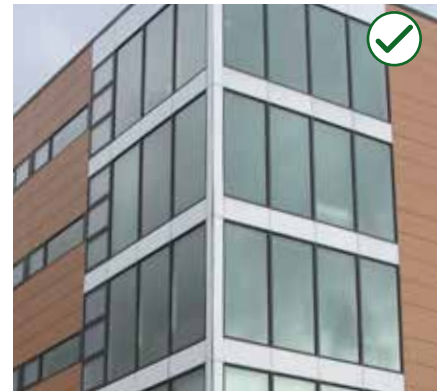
Architectural metal may be considered as a primary building material for design alternatives on building walls.
